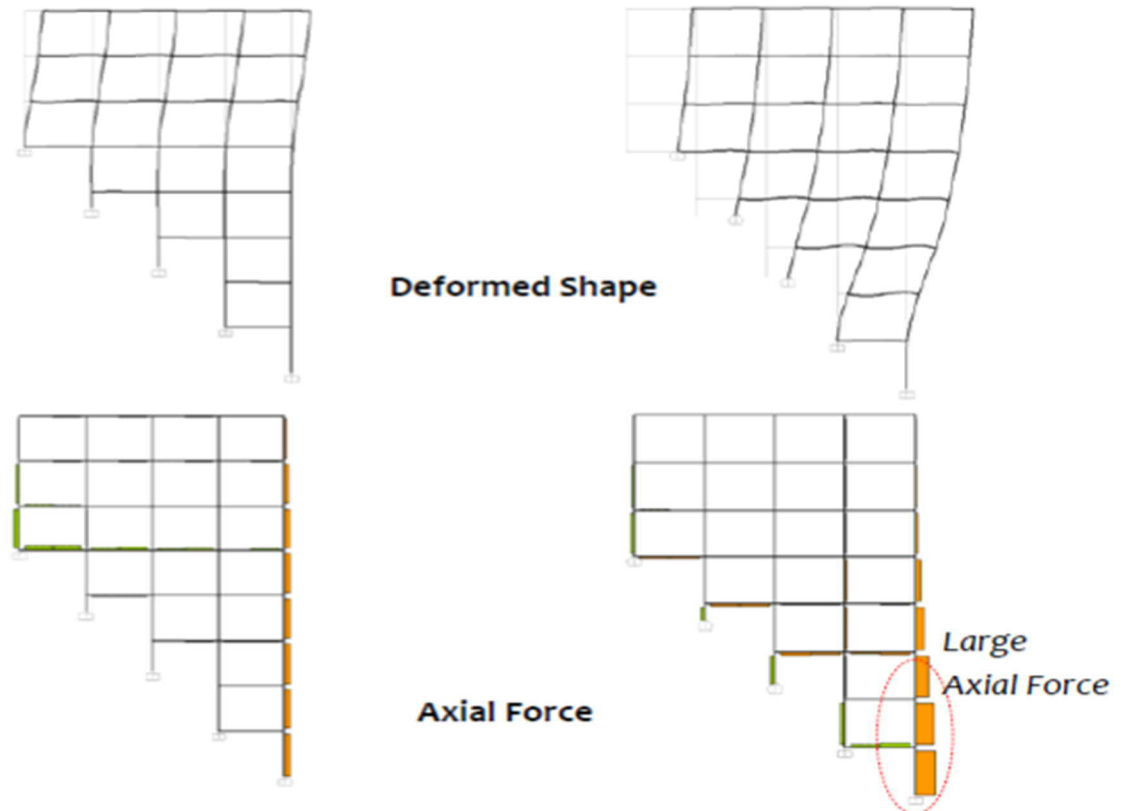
Deformed Shape and Axial Force in Building A and Building B
